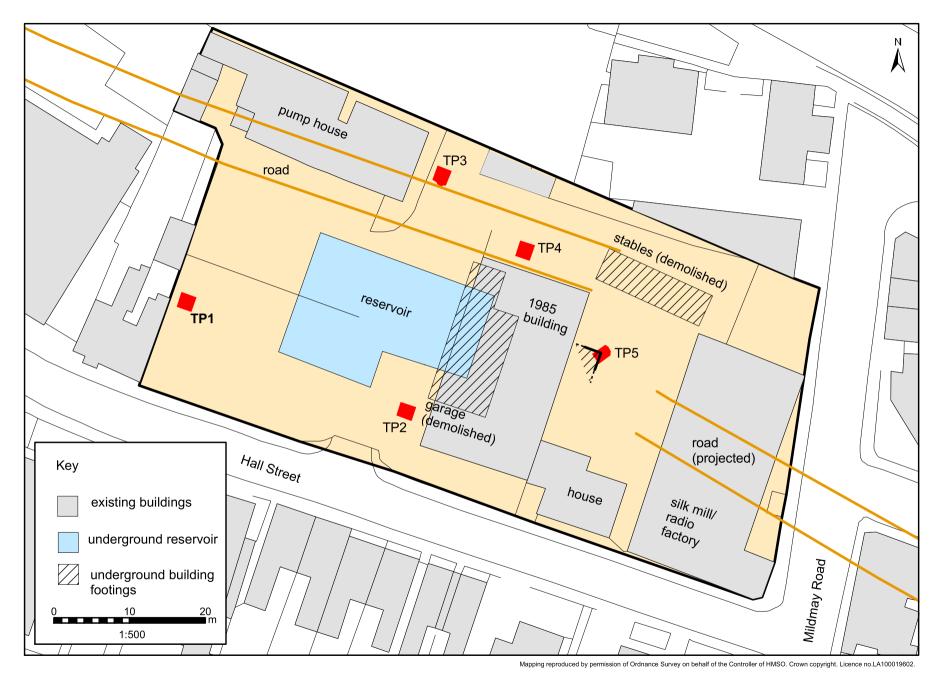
Site plan showing constraints, trial pit locations and Roman roads
